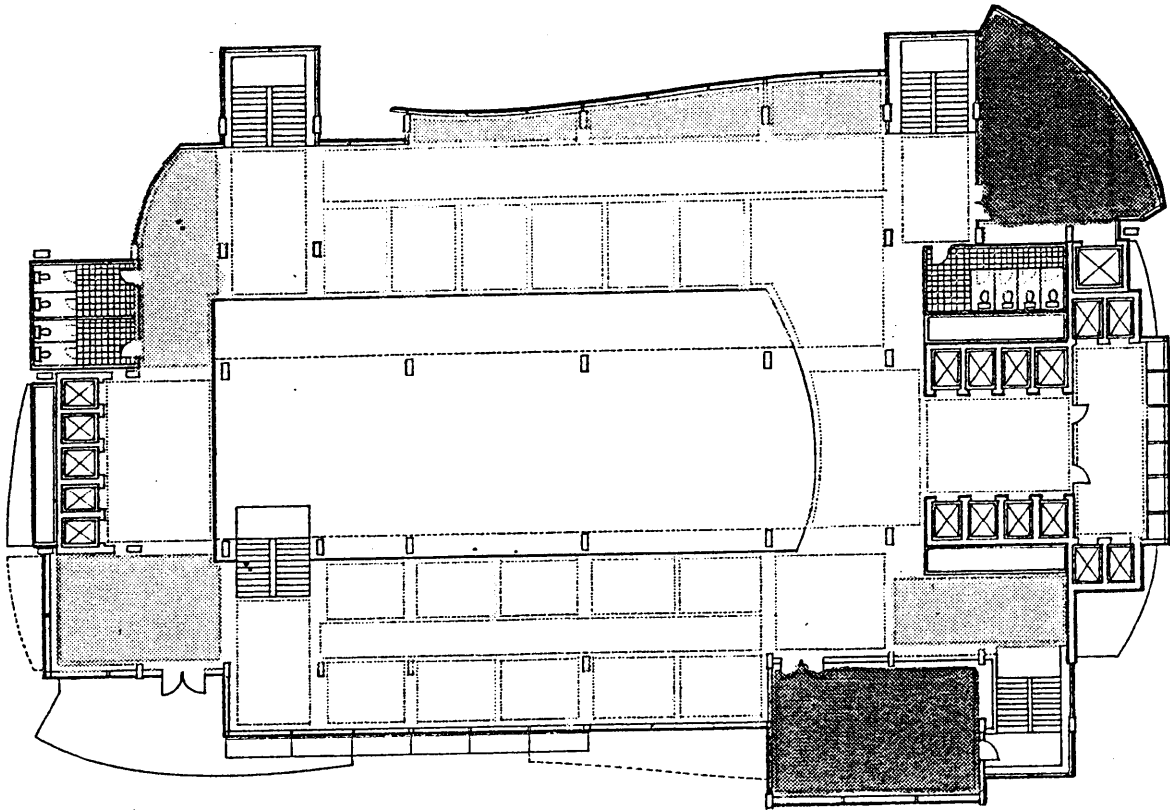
Intermediate Floor Plan, showing corner elements and North Mezzanine
